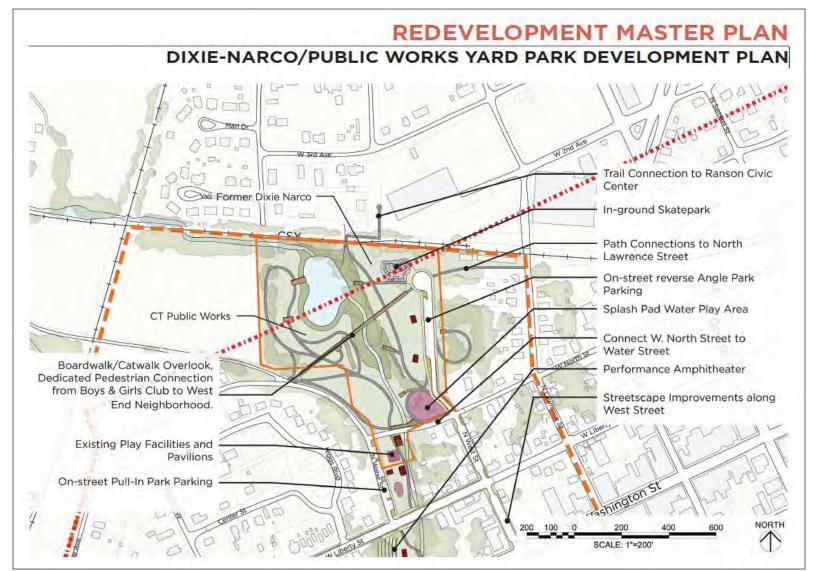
Dixie-Narco/Public Works Yard Park Development Plan
